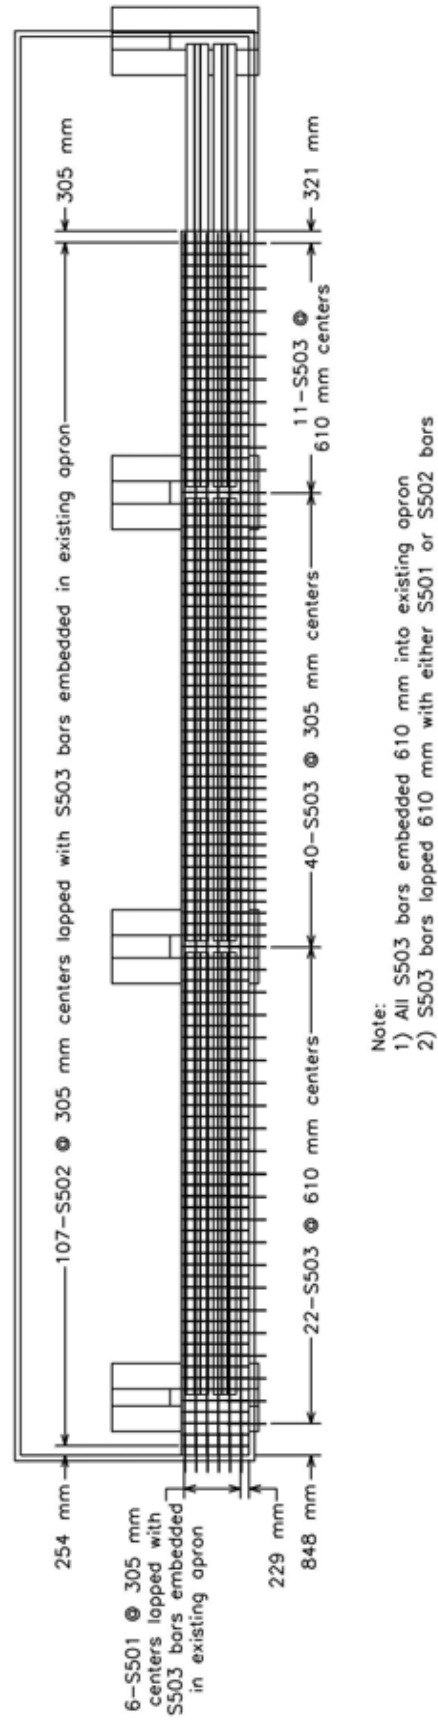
Inverted Tee Bridge Deck System Reinforcement Details
